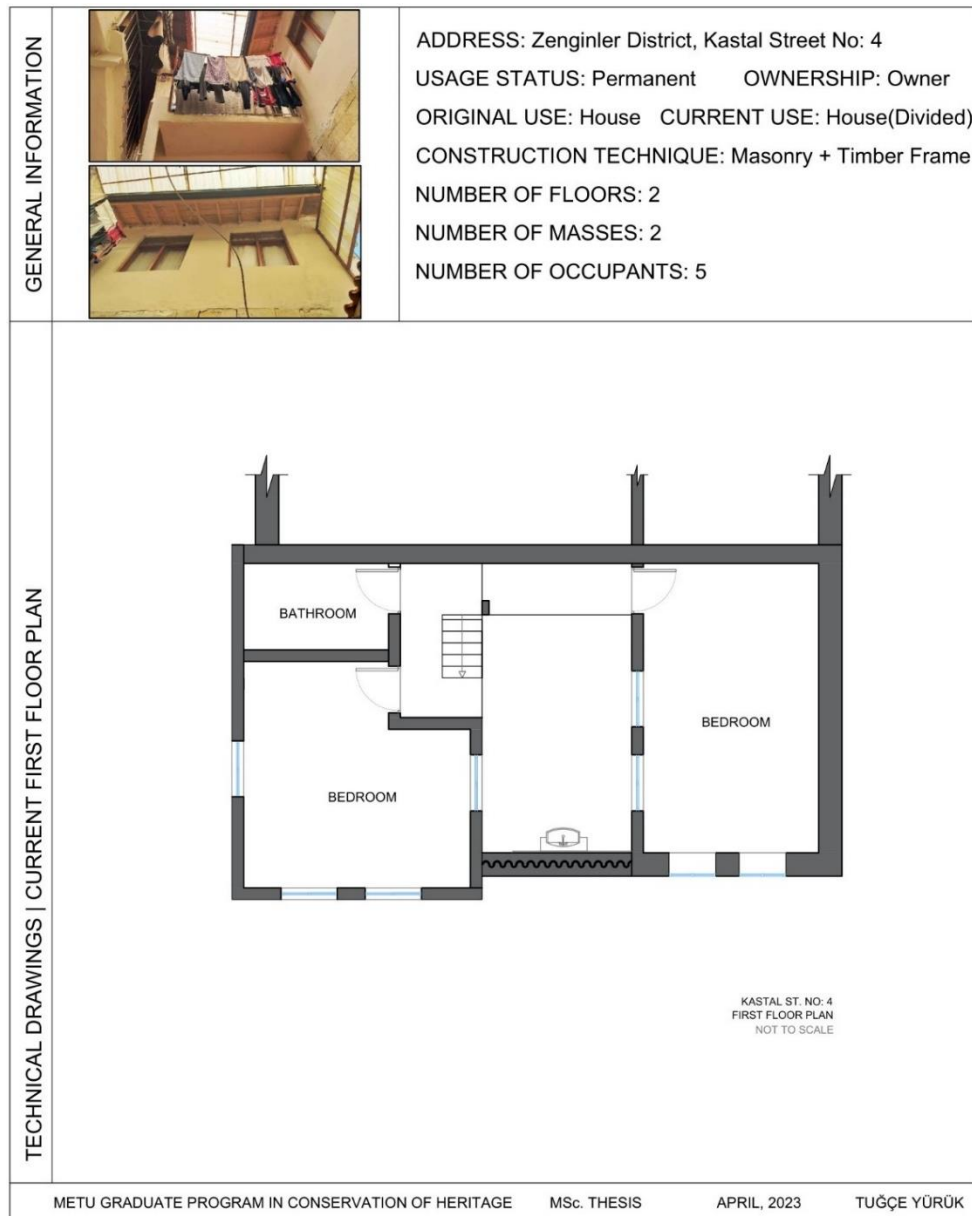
Current first floor plan of Kastal-4 House (Author, 2023)
